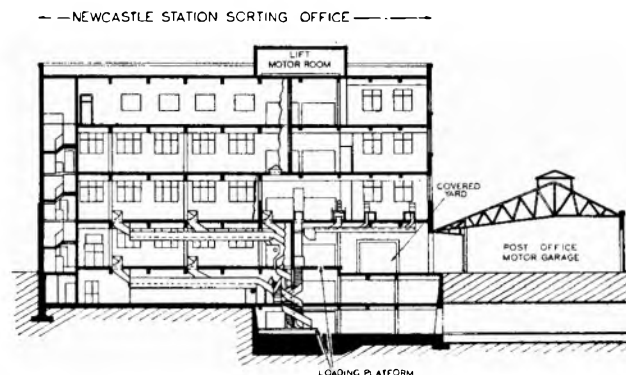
SECTIONAL ELEVATION OF SORTING
